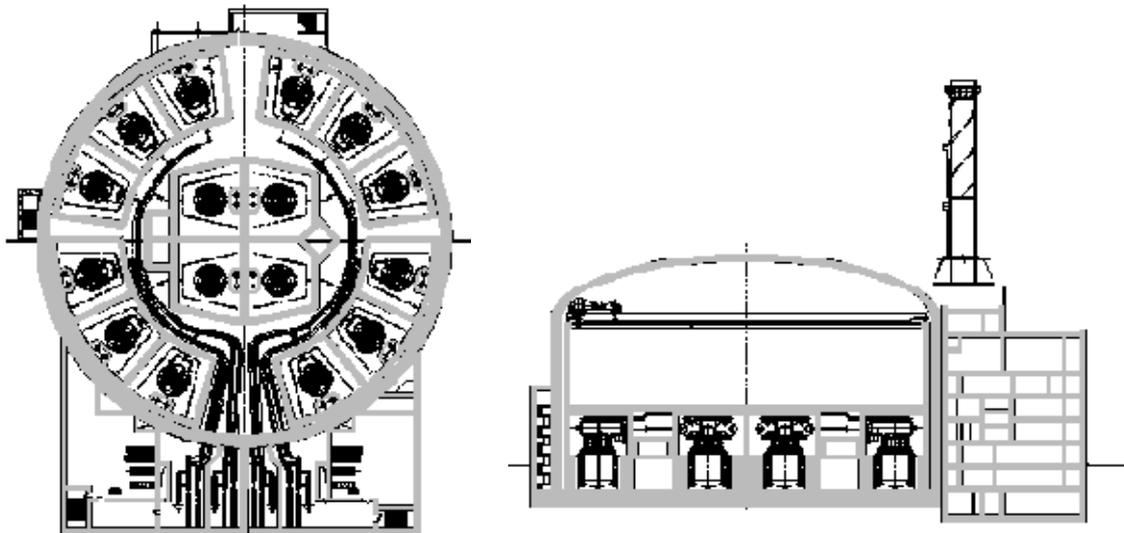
A plan and a longitudinal section of the main building of the NSSS for a 1600 MW(e) plant with the SVBR-75/100 modules.
